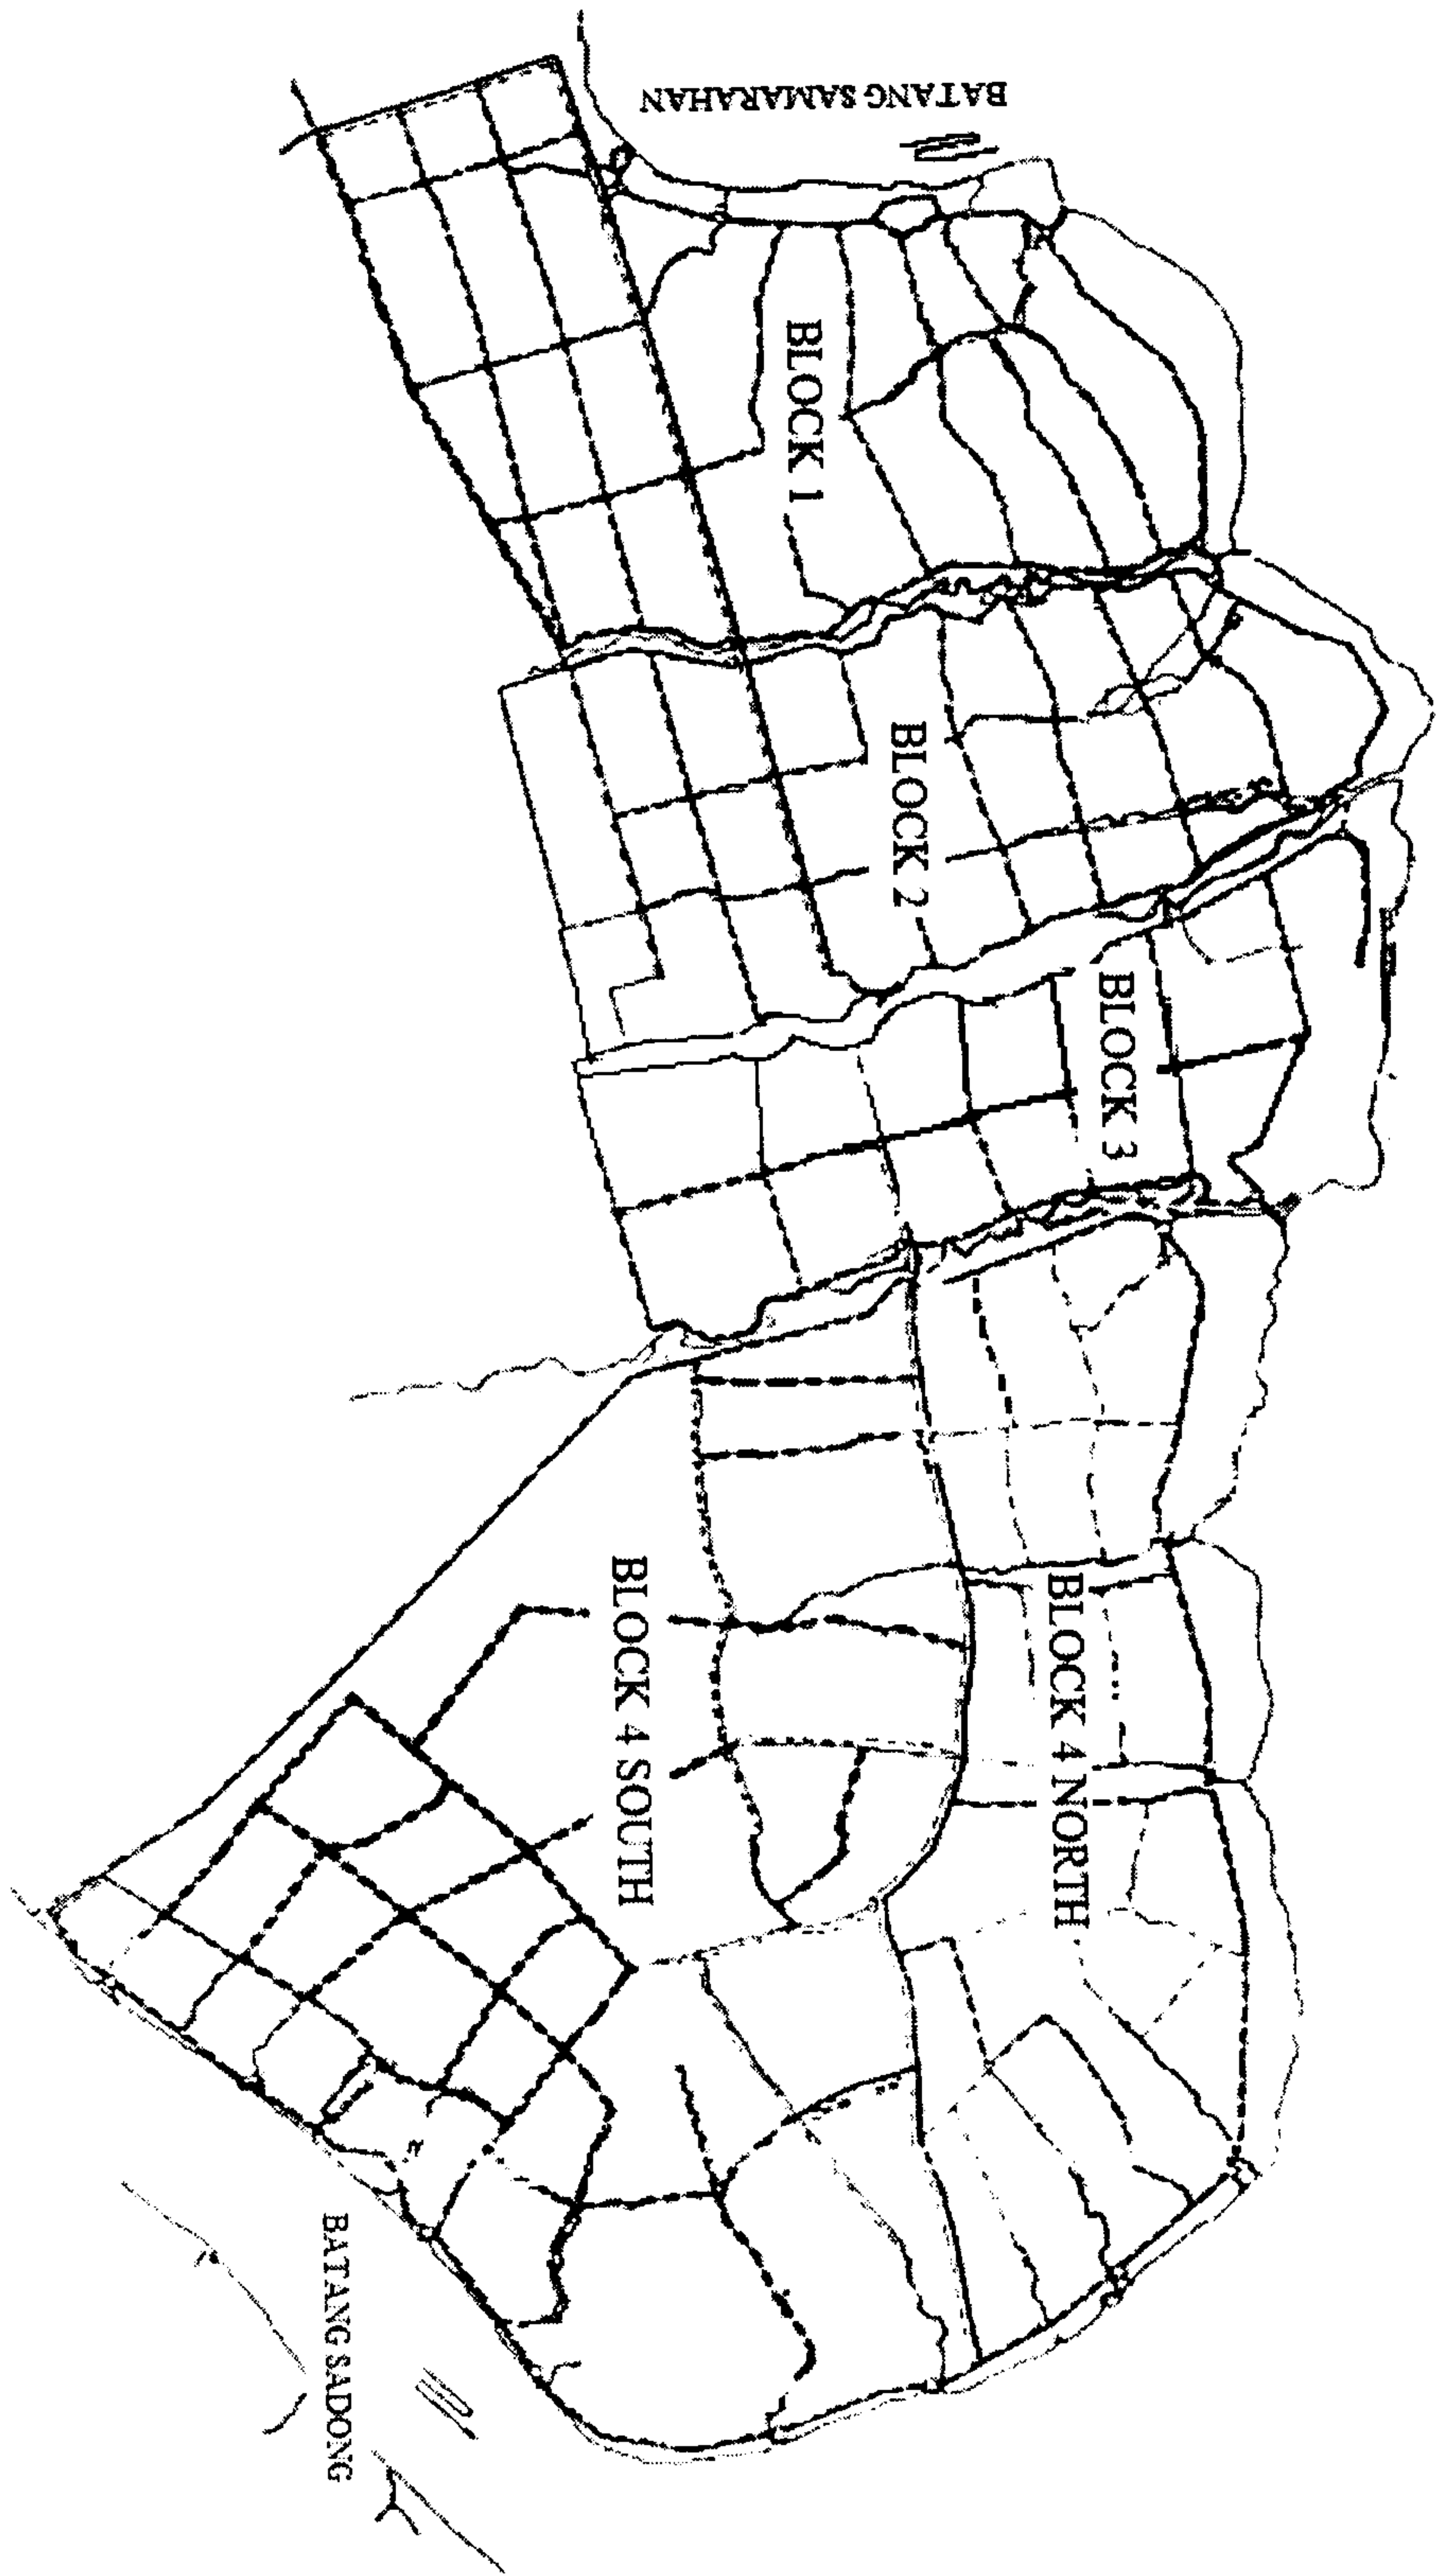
Asajaya Drainage Scheme Project (Source: Department of Irrigation and Drainage of Sarawak)
